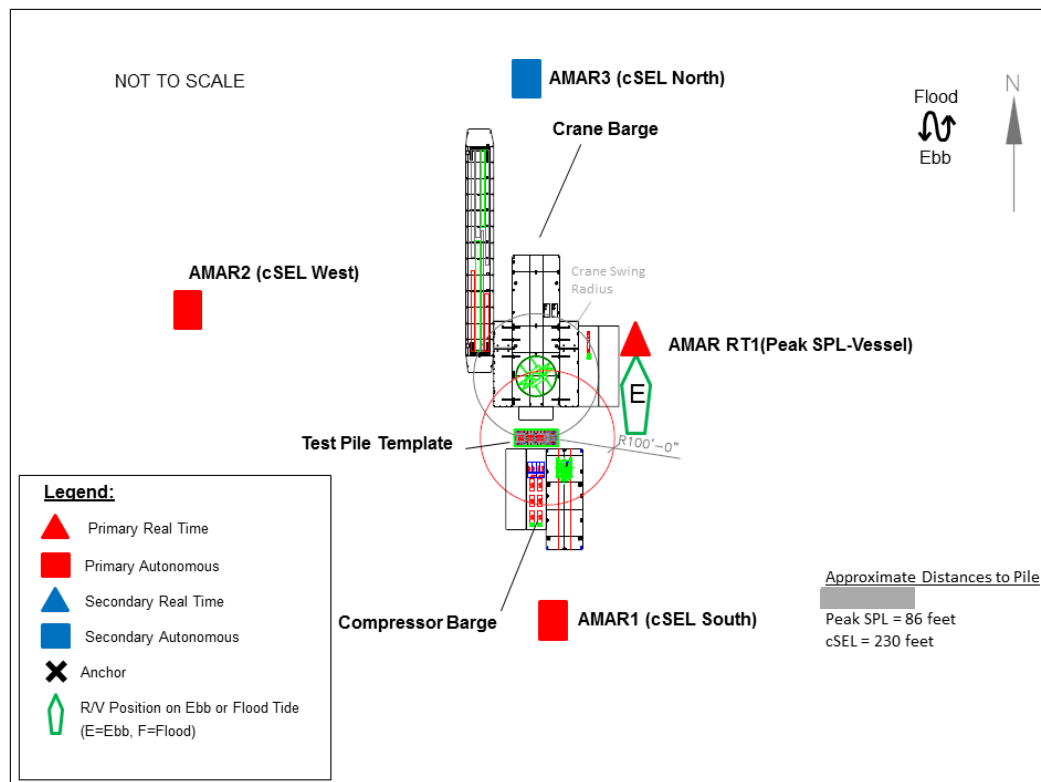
Plan View of a Typical Test Pile Barge Arrangement and Hydrophone Locations for piles
